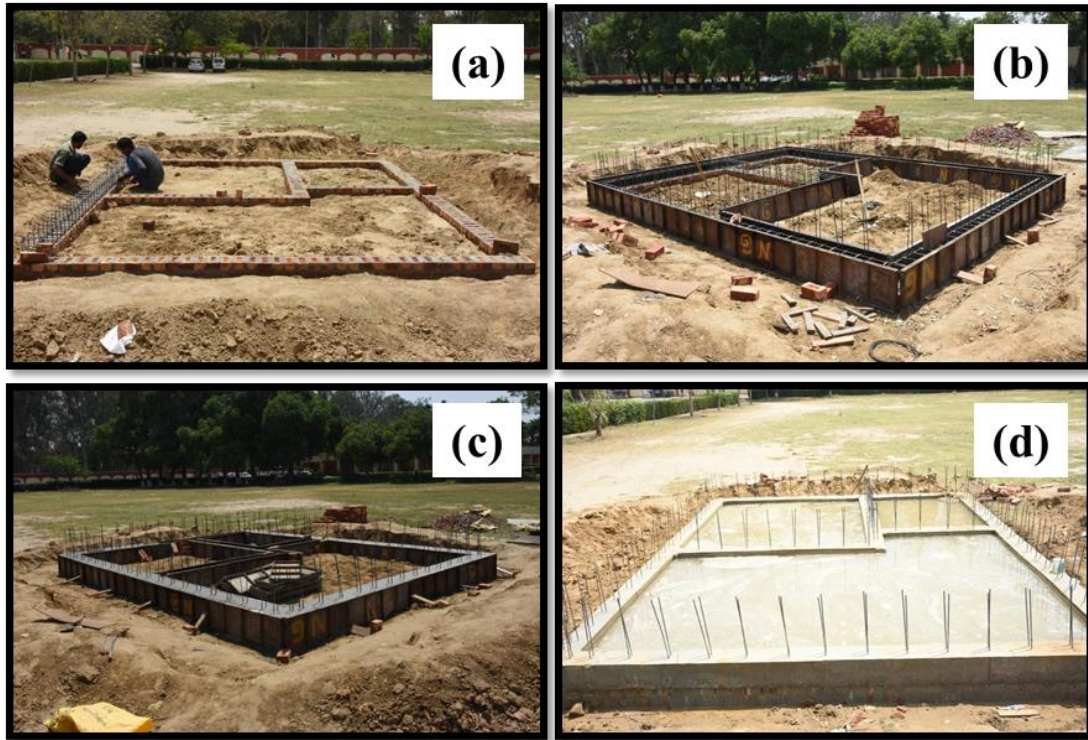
4: Construction of building using CSP (a) foundation being laid; (b) shuttering for plinth beam; (c) concreting of plinth beam; (d) dowel bars erected on plinth beam
